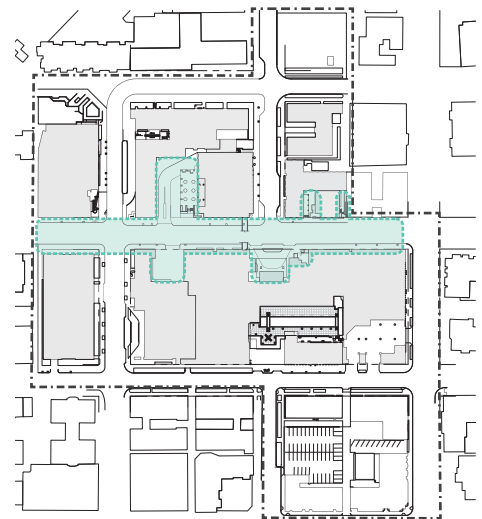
SENECA STREET PROPOSED PLAN EAST
